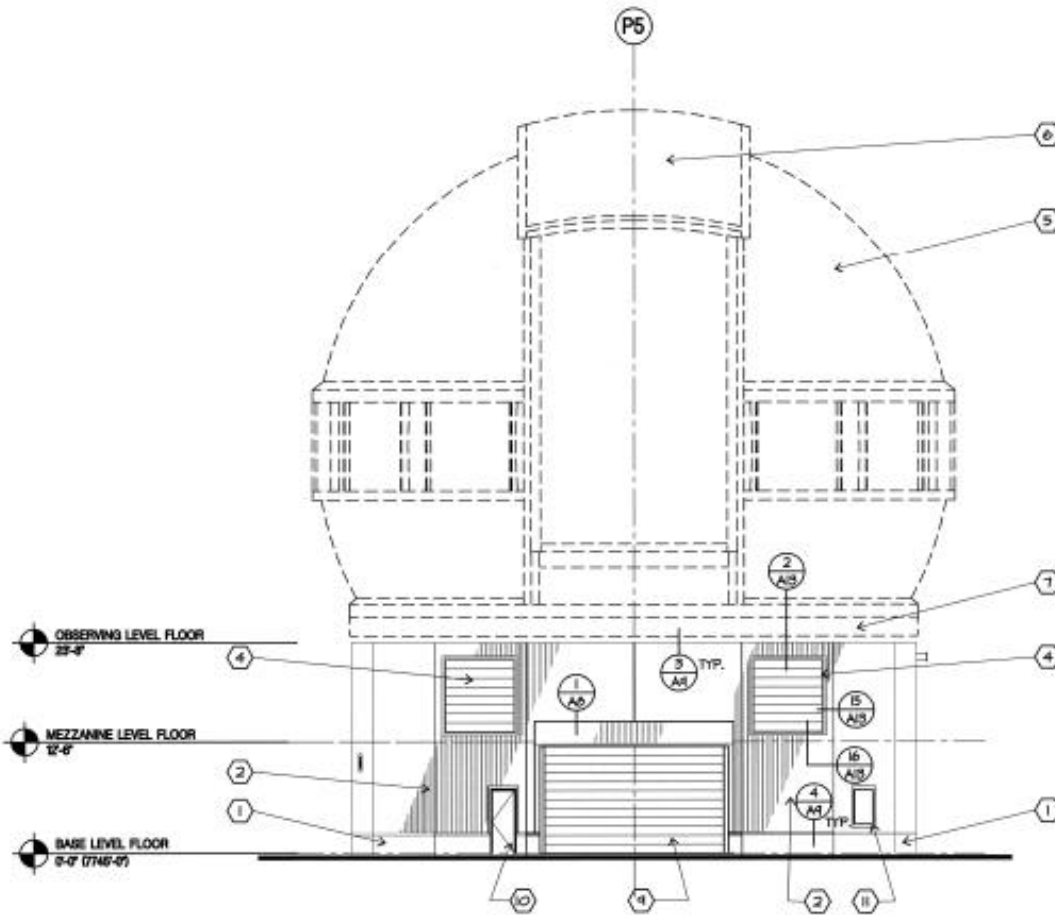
DCT Dome Conceptual Design, East Elevation
